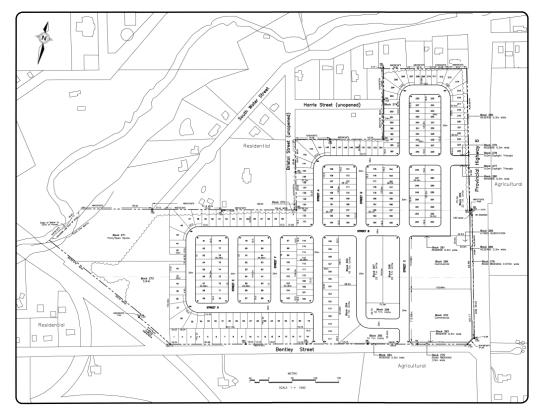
Draft Plan of Subdivision 23T-13002, submitted by J.L. Cox Planning Consulting Inc.
